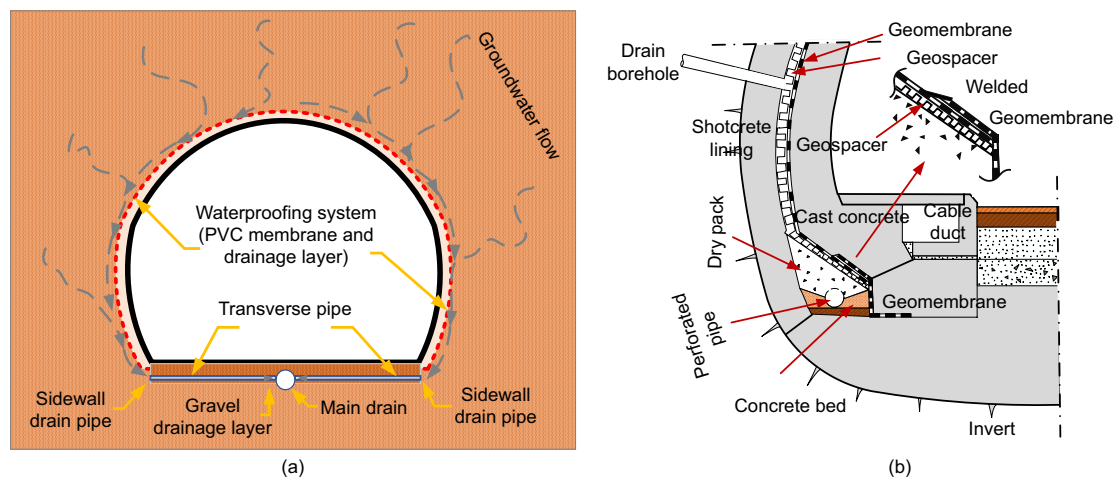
Schematic diagrams of drained tunnel and cross section of lining system: (a) drained tunnel; (b) cross-section of lining system (after Kolymbas 2005)
